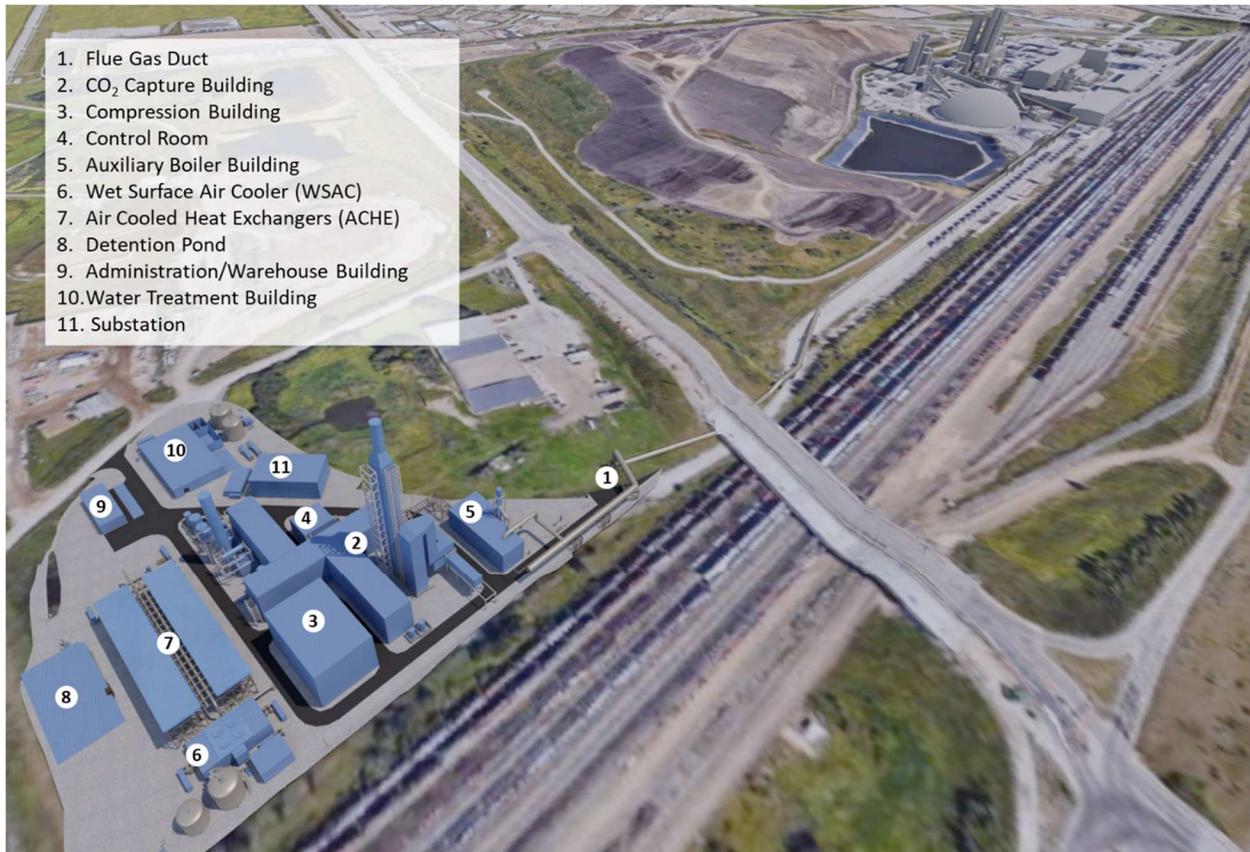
WEST OF 170 LOCATION CCS AND BOP FACILITIES LAYOUT
